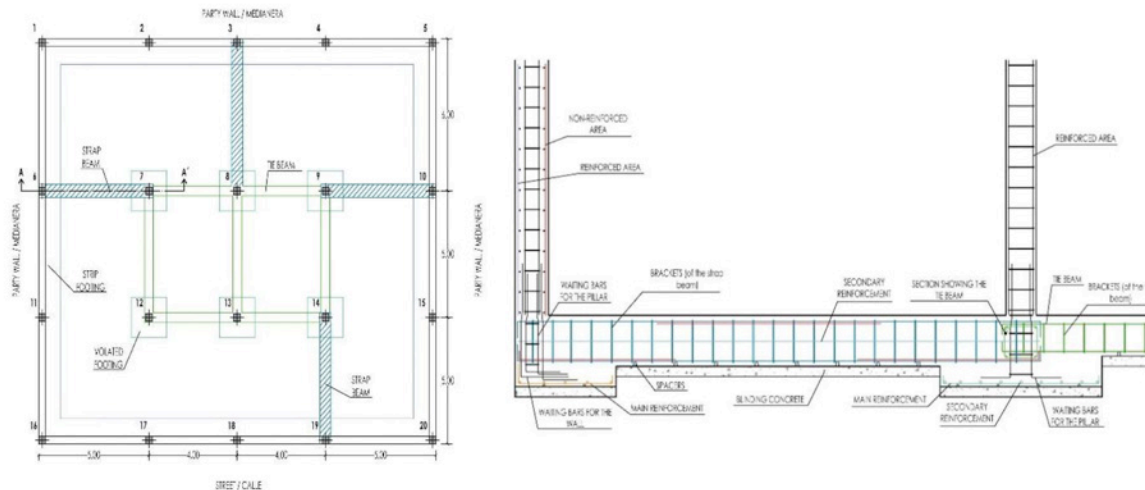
2D foundation details. Plant and section. Traditional system for teaching details.
